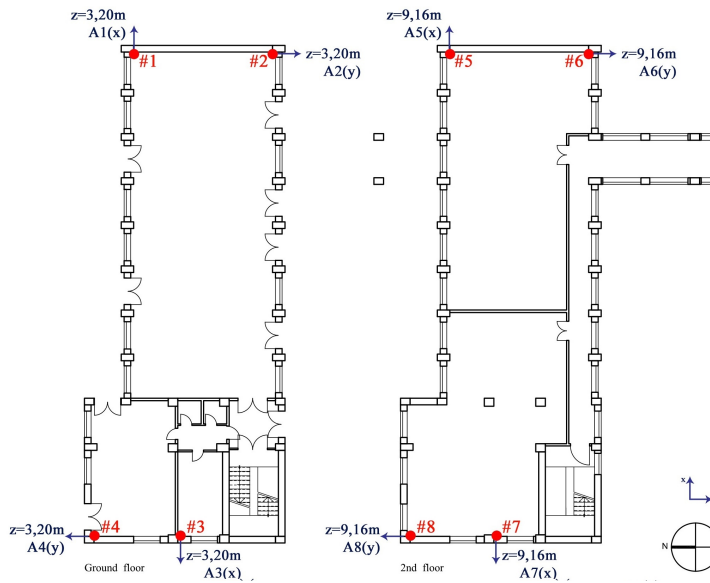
Position, elevation and reading direction of the accelerometers at the ground floor and 2nd floor
